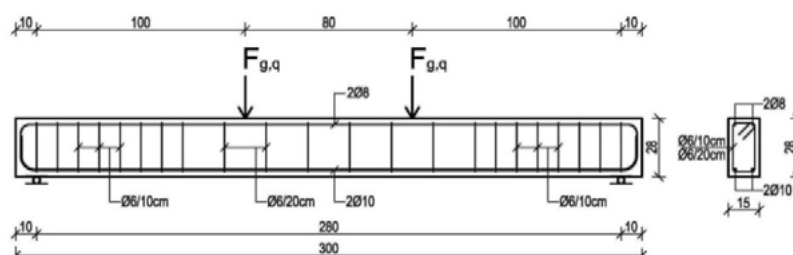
Geometry, reinforcement and loading scheme of full scale beams
